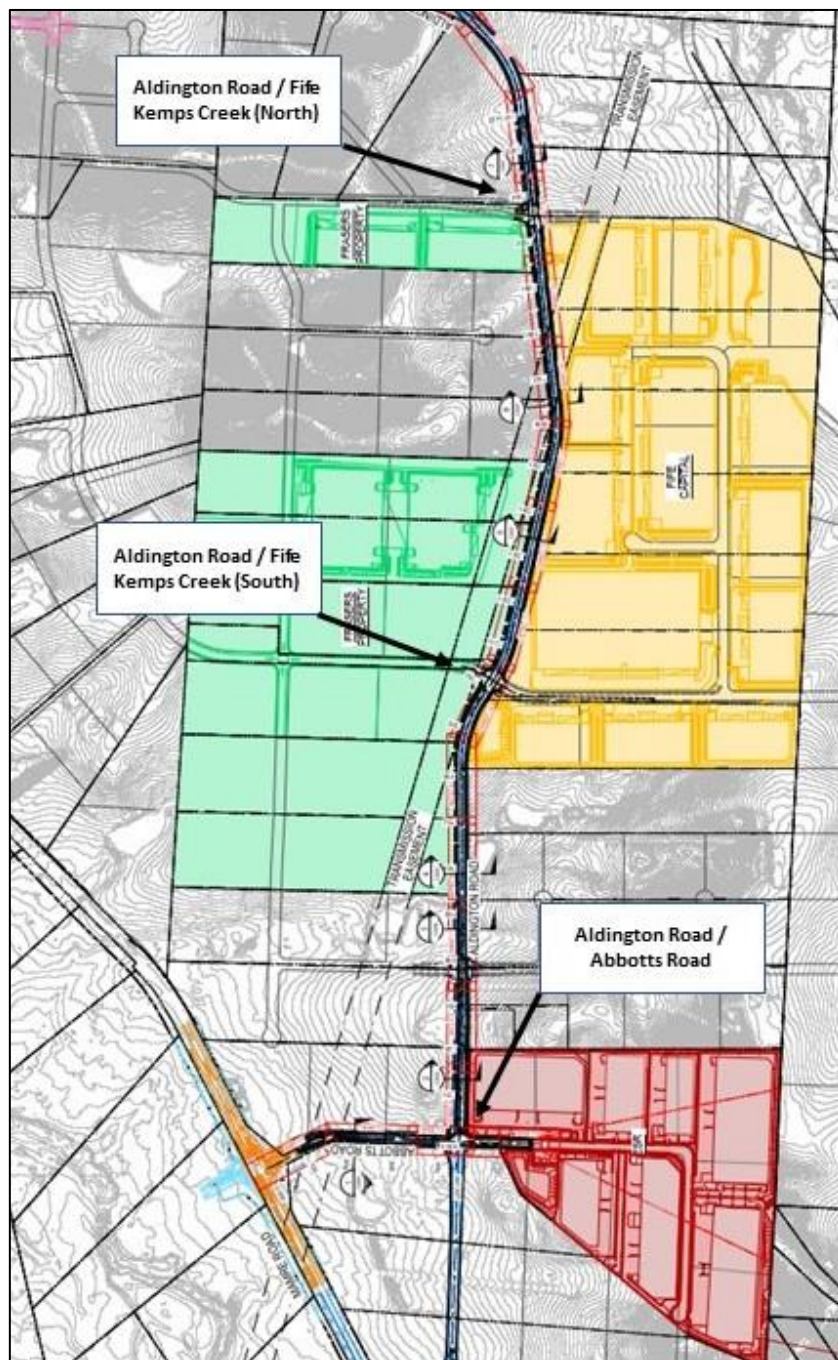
Intersections along Aldington Road Source: AT&L Drawing No. 21-843-C502
